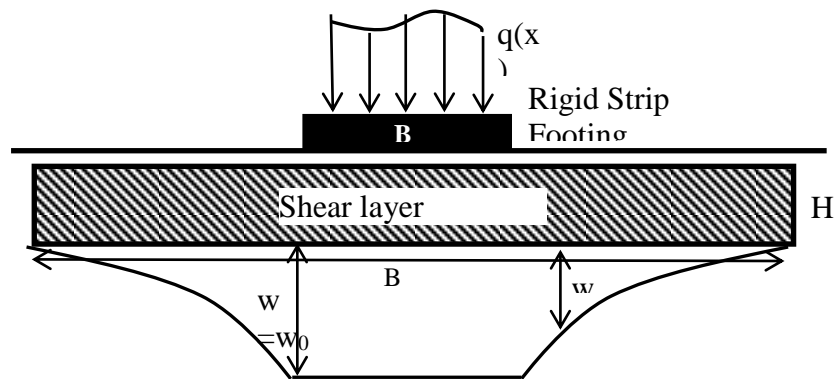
Deflection profile of Pasternak shear layer over Winkler springs
